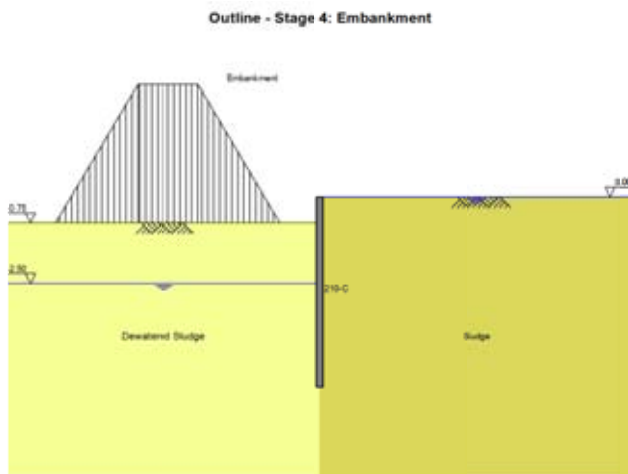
Schematic view of embankment height rising with vinyl sheet piling
